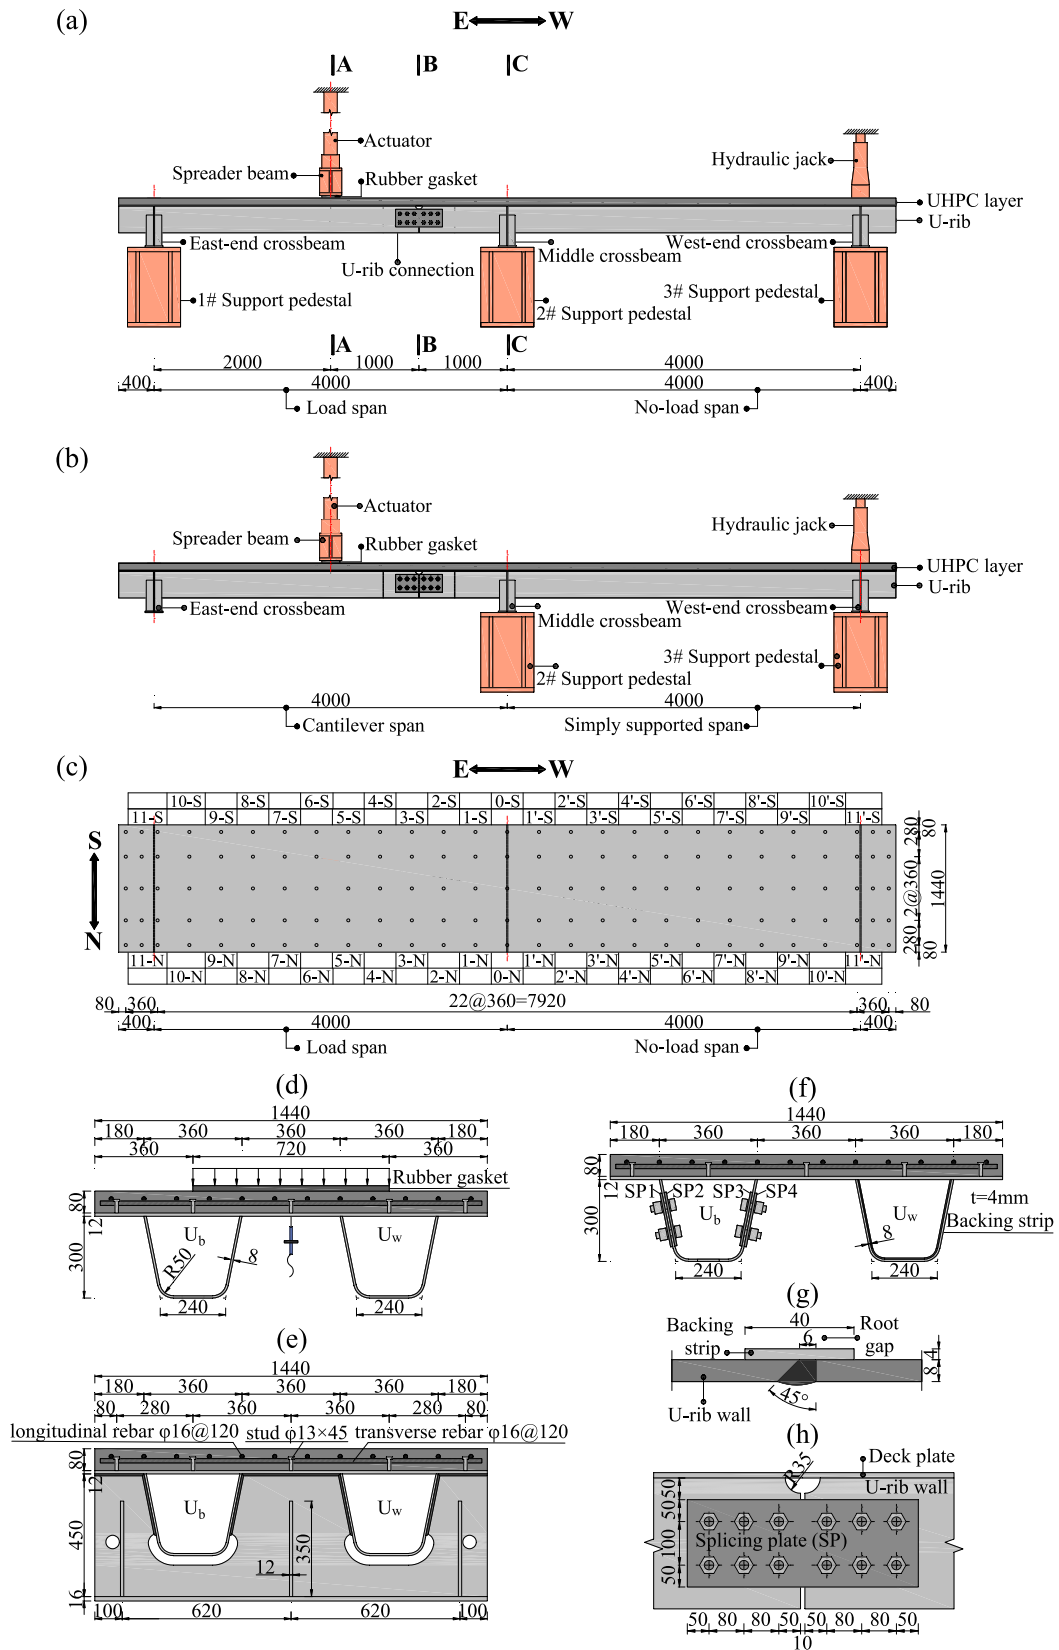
Details of full-scale specimen (unit: mm): (a) elevation view and test setup of loading phase I ~ V and VII; (b) test setup of loading phase VI; (c) arrangement of the studs; (d) A-A cross section; (e) C-C cross section; (f) B-B cross section; (g) U-rib butt-welded joint; (h) U-rib bolted joint.
